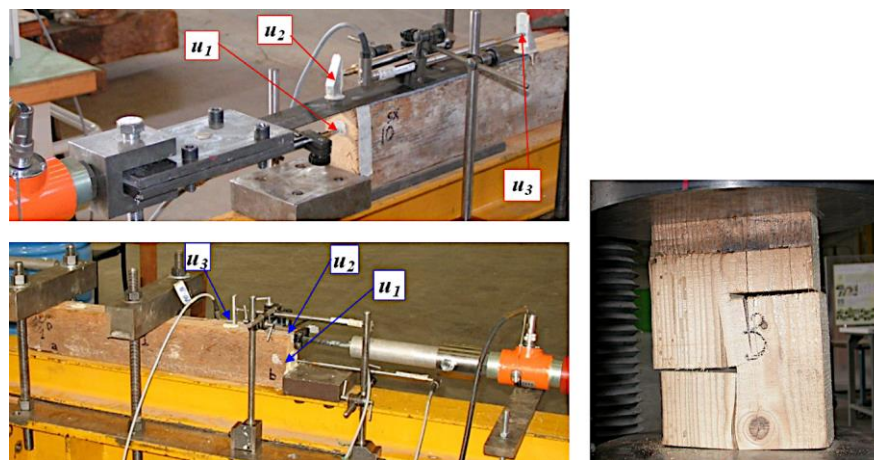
Test set-ups applied by Benedetti and Colla (2010): single-lap shear test on EBR CFRP laminate (top left); pull-out test on NSMR CFRP rods (bottom left); "double cut shear test" (right). Figure adapted from Benedetti and Colla (2010).
